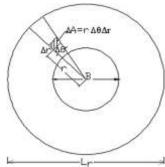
Circular footing over geosynthetic reinforcement (in plan).
